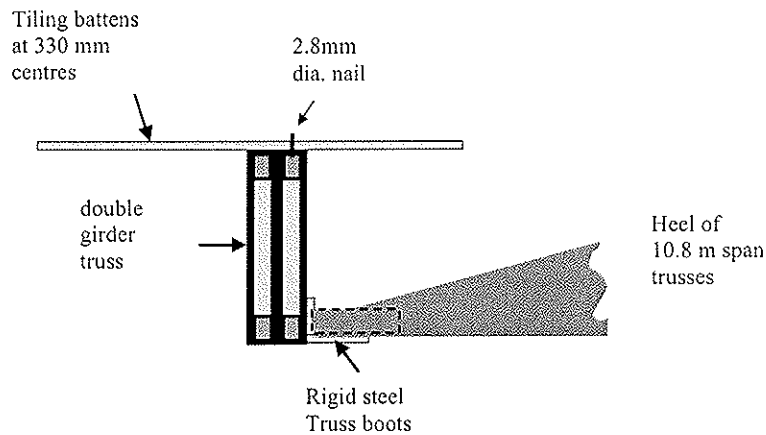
Schematic illustration of lateral support to failed double girder truss.
